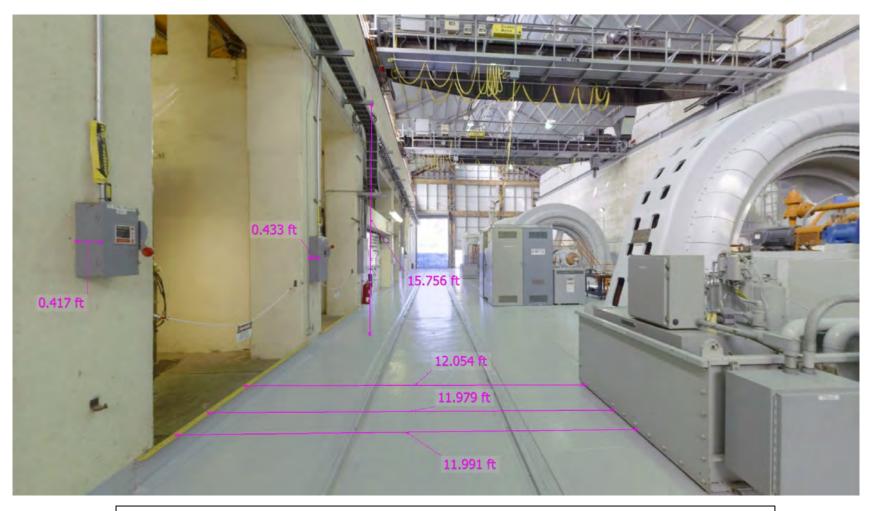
Electrical Switch Box Measurements, Width of corridor between columns 8 & 9 to HPU of Units 1 & 2.
